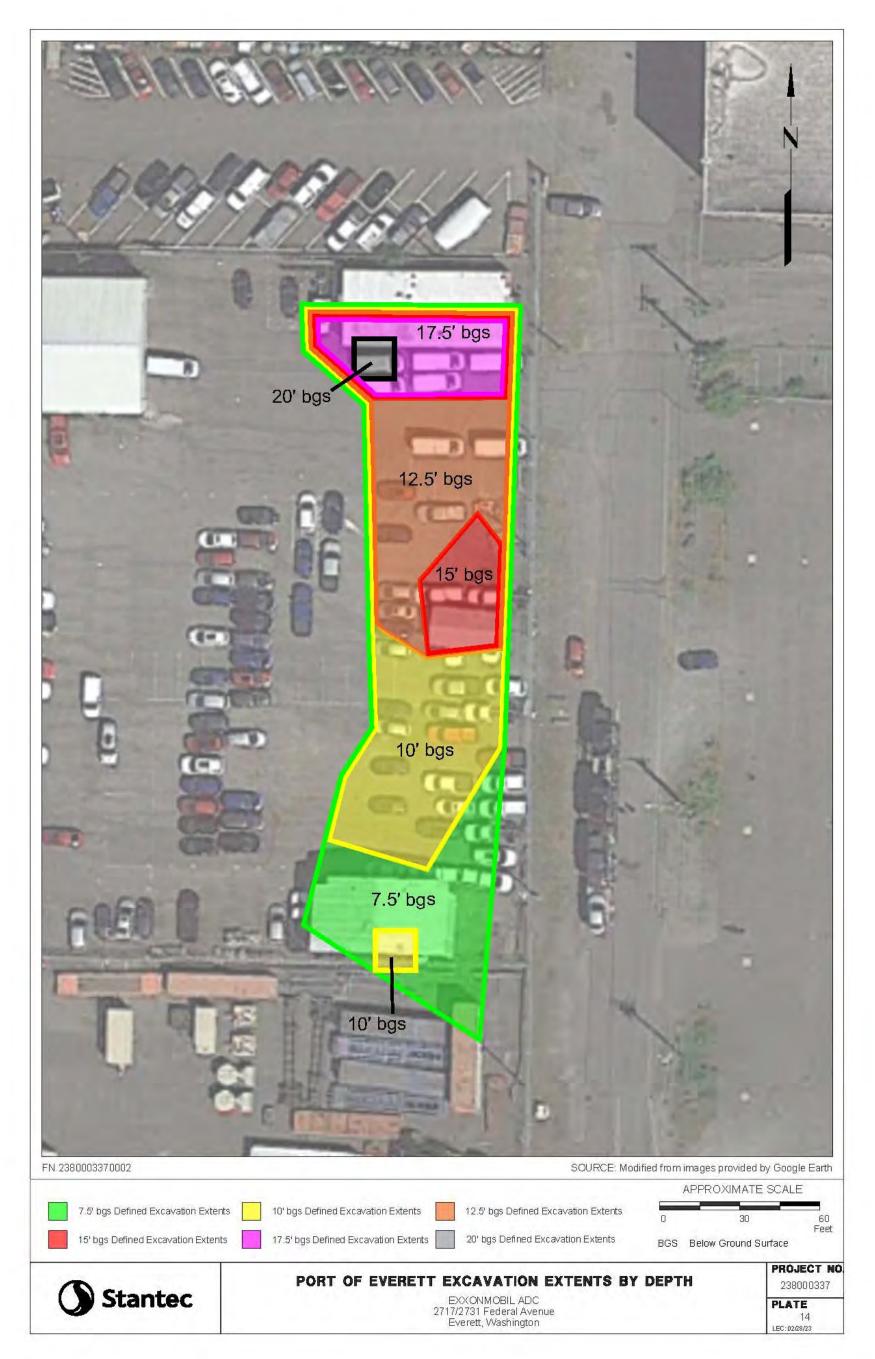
Proposed Excavation Extent on West Side of Federal Avenue
